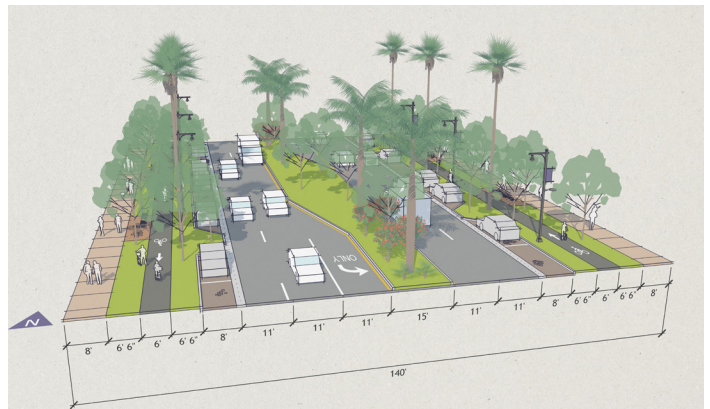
Proposed street section for Fair Oaks Avenue & Monterey Road
